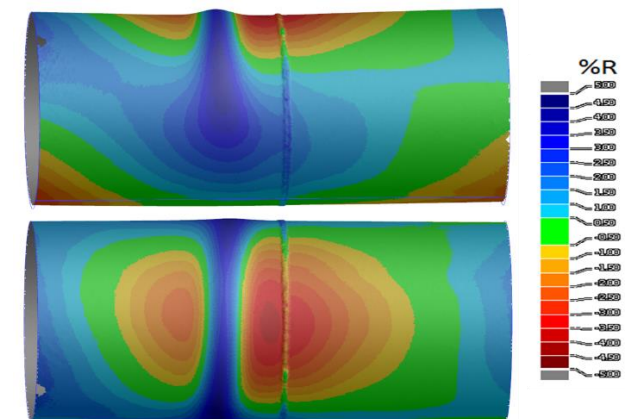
Laser mapping of the Wrinkle, Elevation and Plan views
